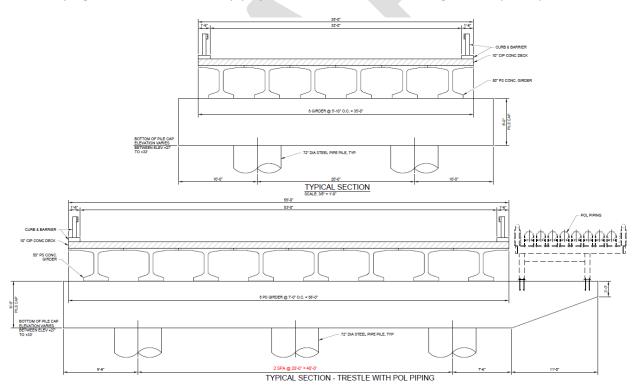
Typical Section for Typical and POL Access Trestles: Alternative 2A with 72-inch-diameter Driven Piles
